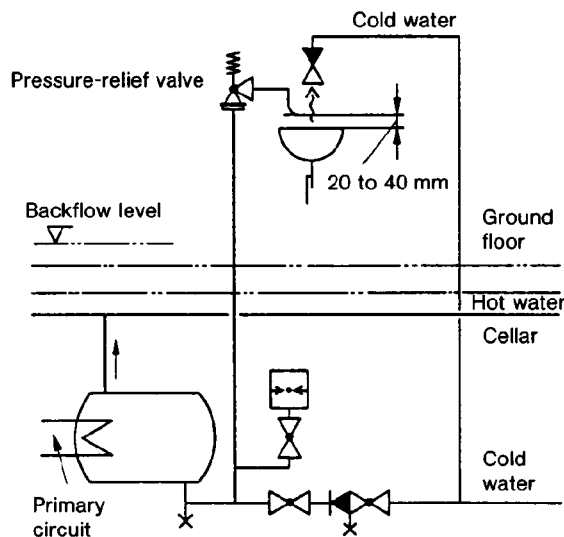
Installation of pressure-relief valve and water heater in different rooms on the ground floor
